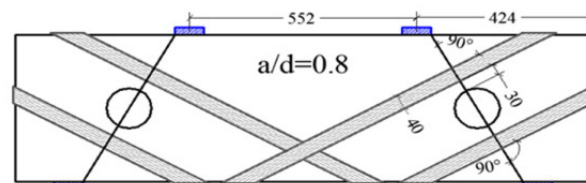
Details of strengthened deep beam with openings (DO-0.8-I)
